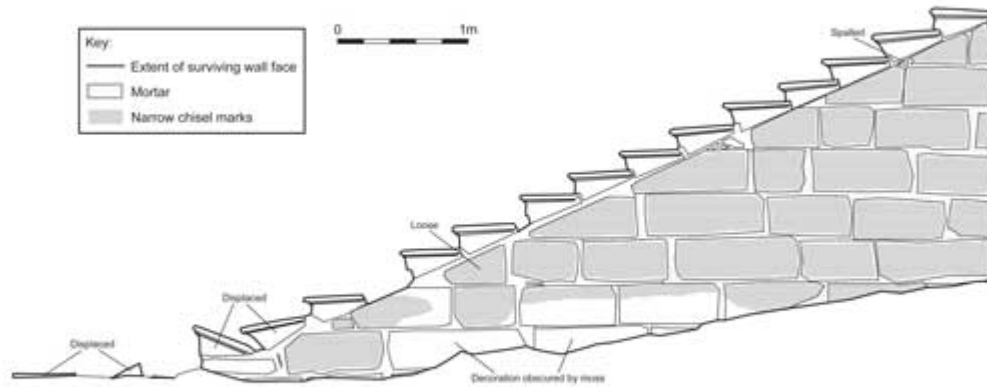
Structure 2, East Stair: Elevation d (East wall of Stair)
